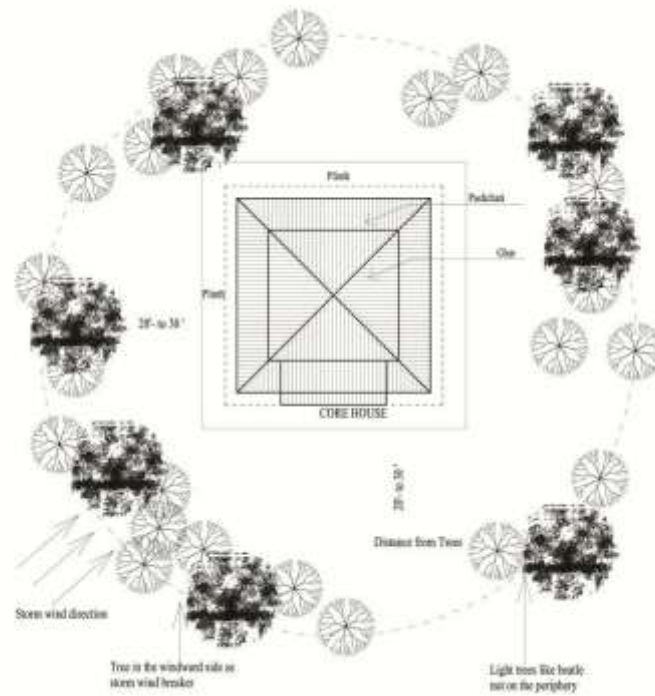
House layout considering wind direction, plantation distance, orientation (Source: Islam, S. M. et al, 2014)
